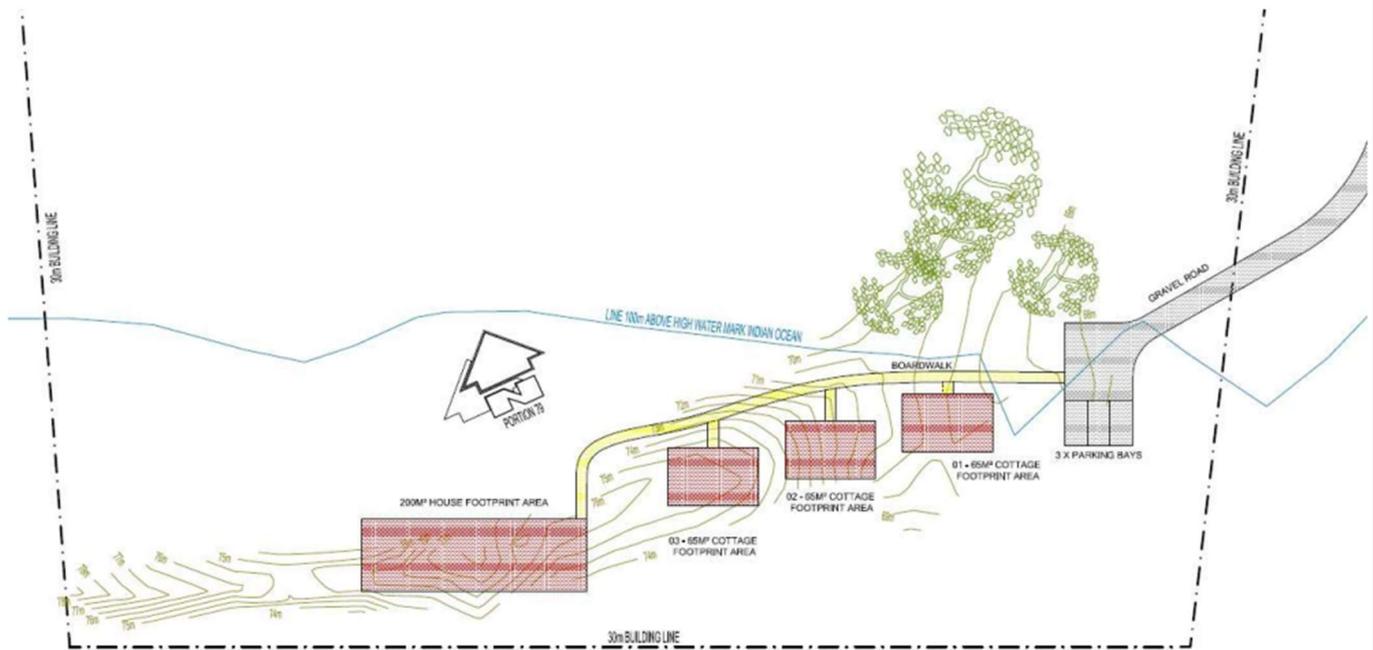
SITE PLAN AND CONCEPT DESIGN
